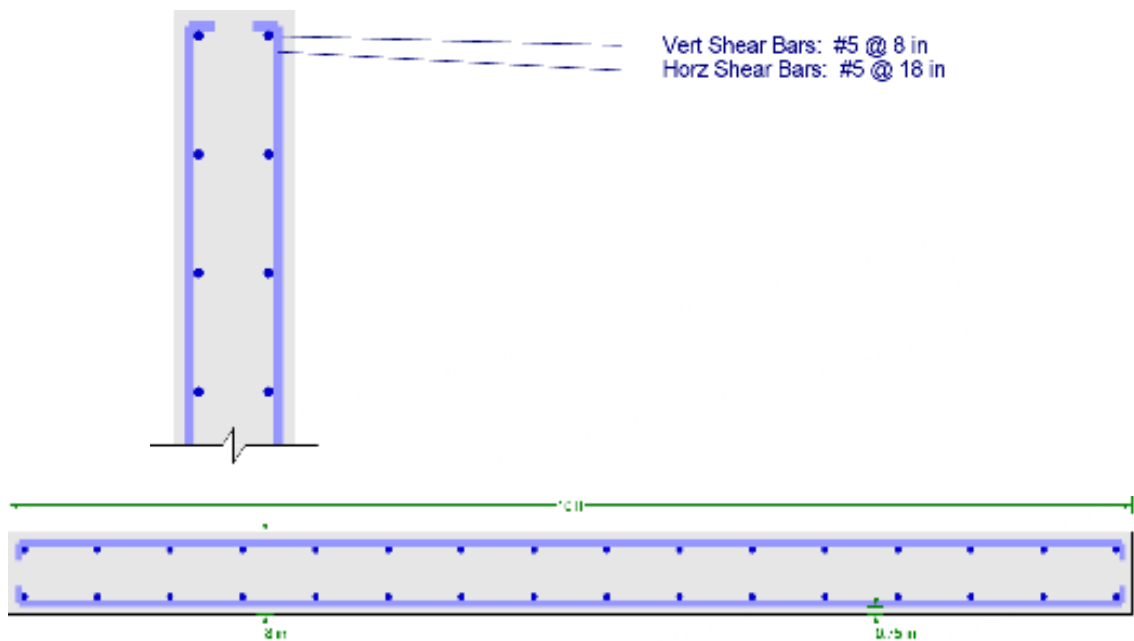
Building (B2-6S-M-S) Special RC Shear Reinforcement Details; Wall Section for Floors 4-6
